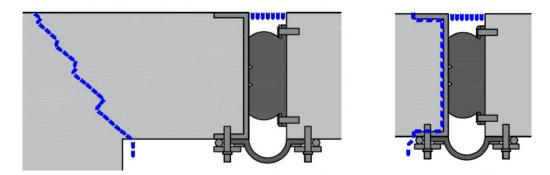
Leakage around the immersion joint: crack in the concrete frame(left) and piping (right) (Van Montfort, 2018)
